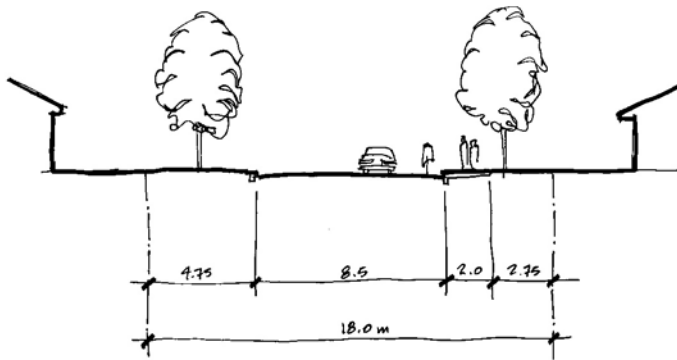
Local Road: Standard 18 metres ROW with sidewalk on one side (illustration only)
